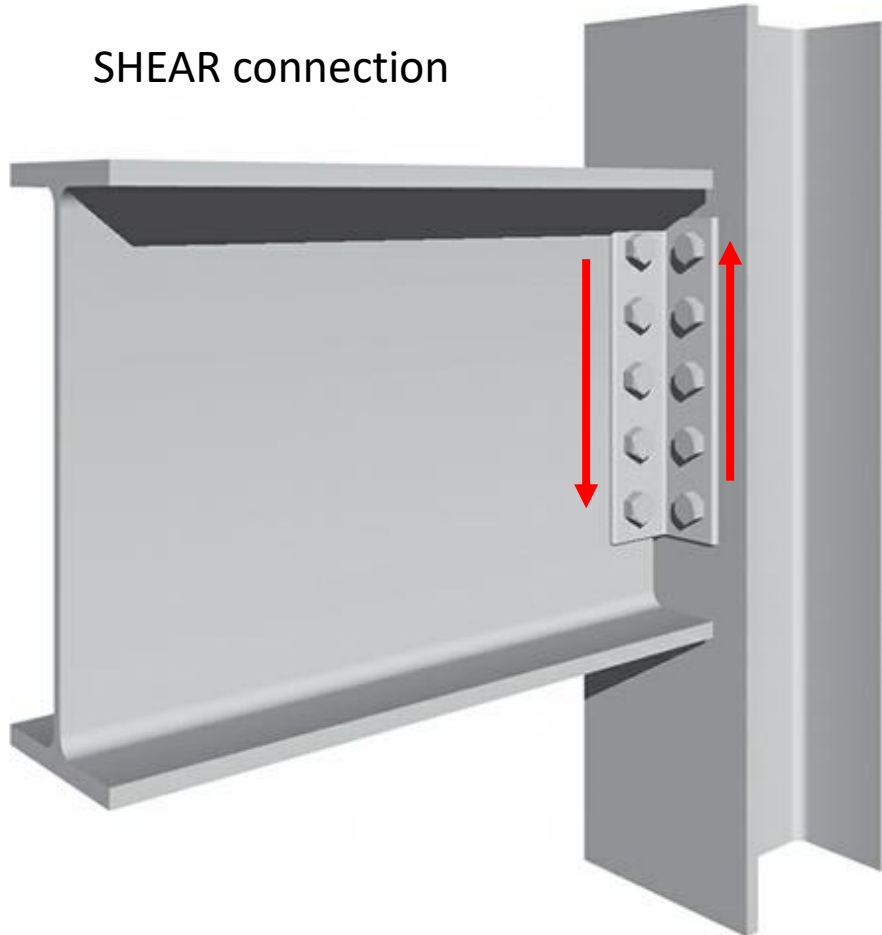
A pictorial view of a framed, bolted beam-to-column-flange shear connection.
